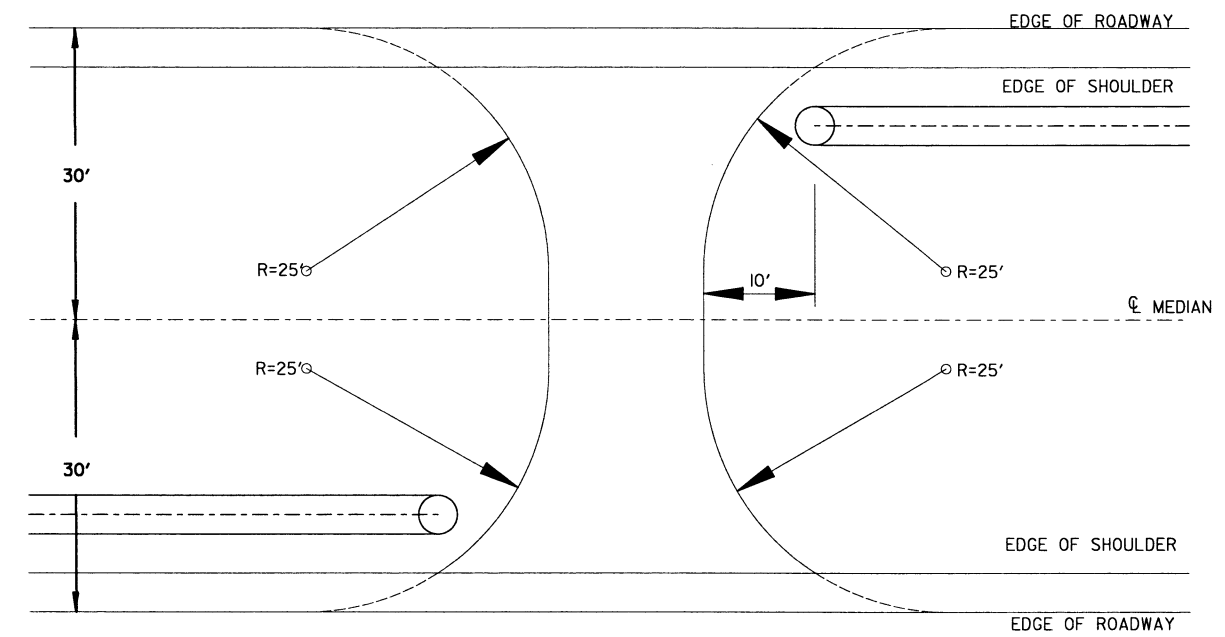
DETAIL OF WIRE ROPE SAFETY FENCE AT EXISTING BRIDGE ENDS
